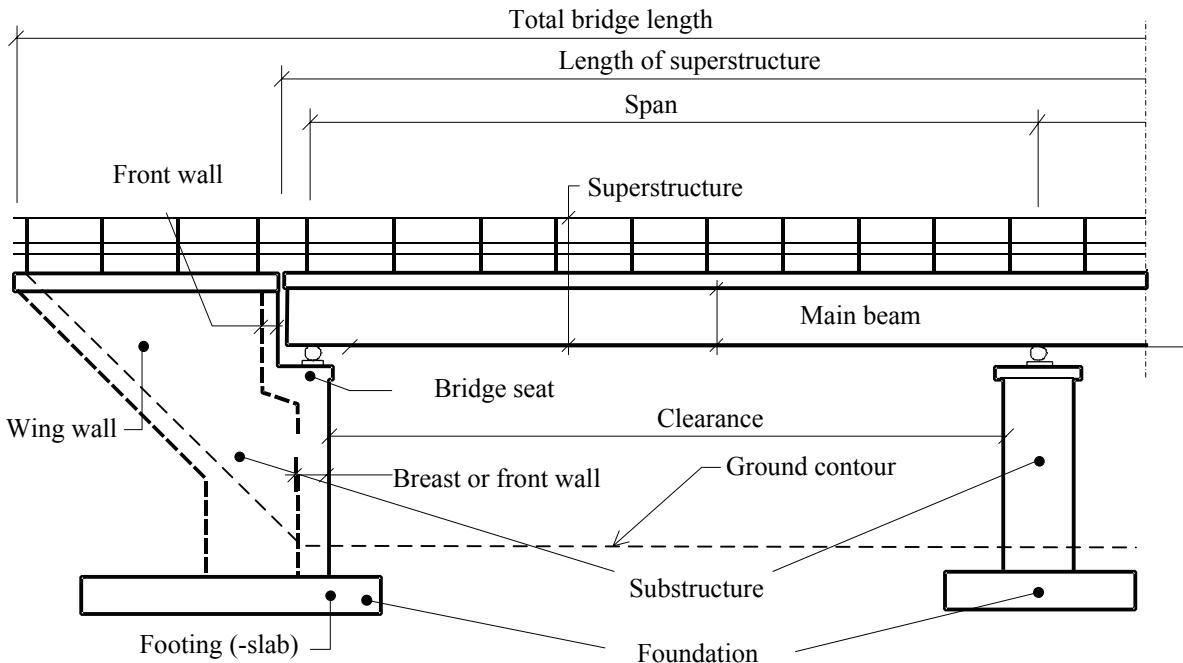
Superstructure, substructure and foundation for a bridge.
